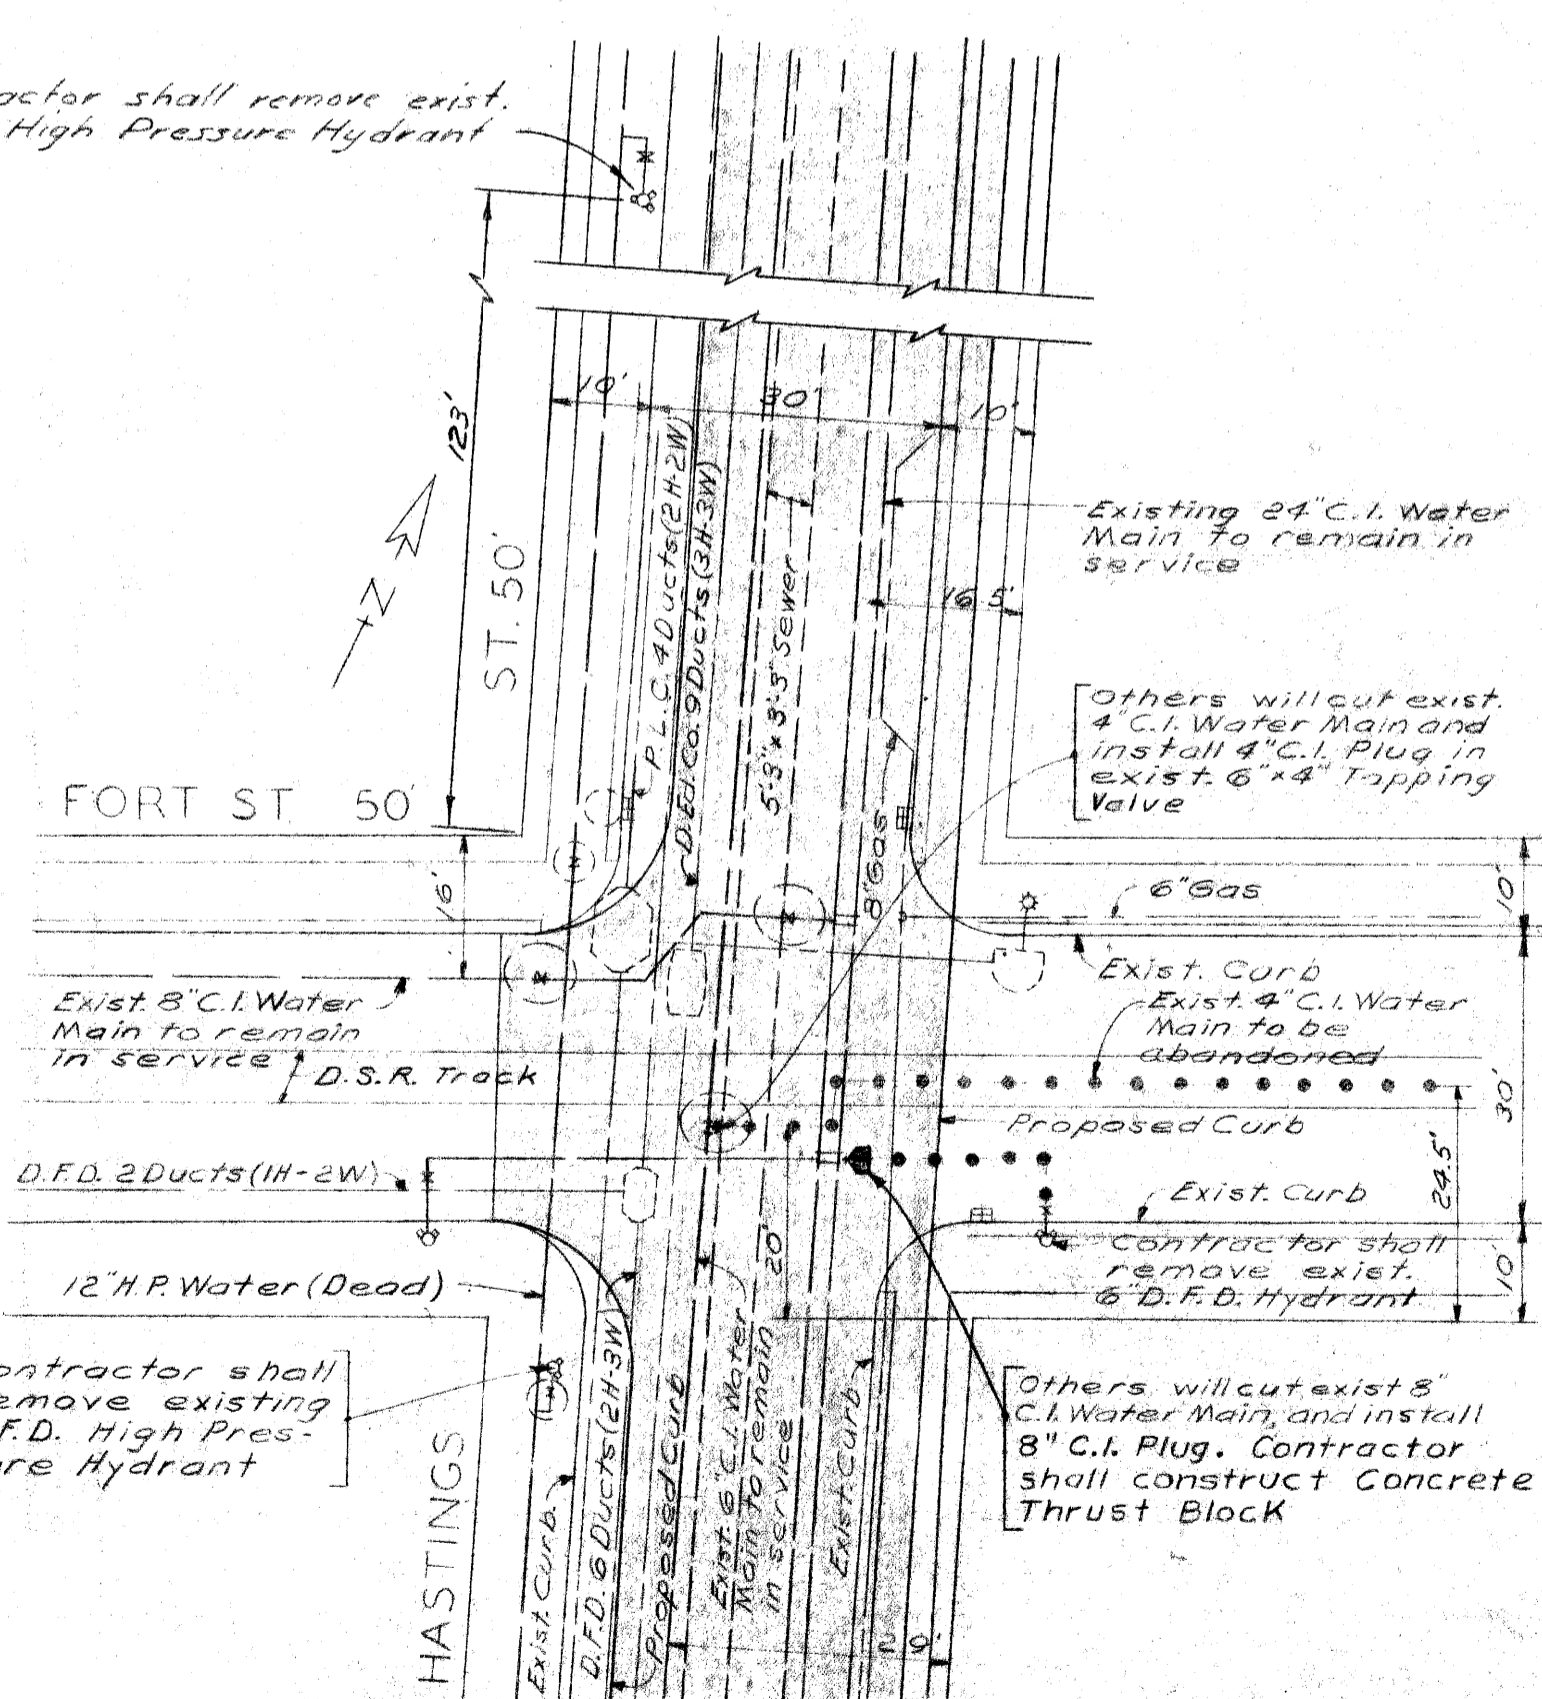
DETAIL 'E' FROM DRAWING NO. 6 Scale: 3/8"=1'-0'
